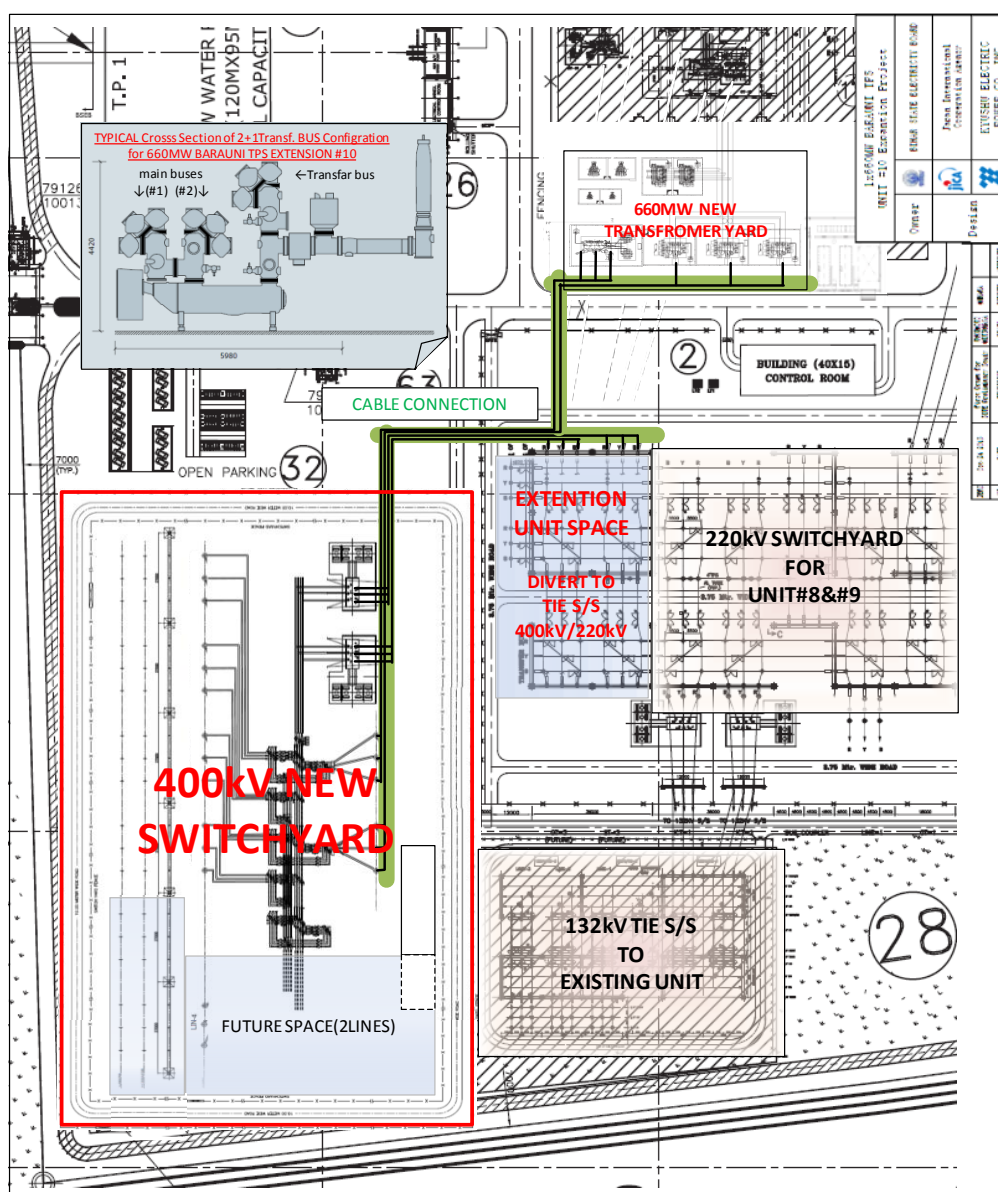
Preliminary Plot Plan for Barauni 400 kV Switchyard (JICA Study Team)
